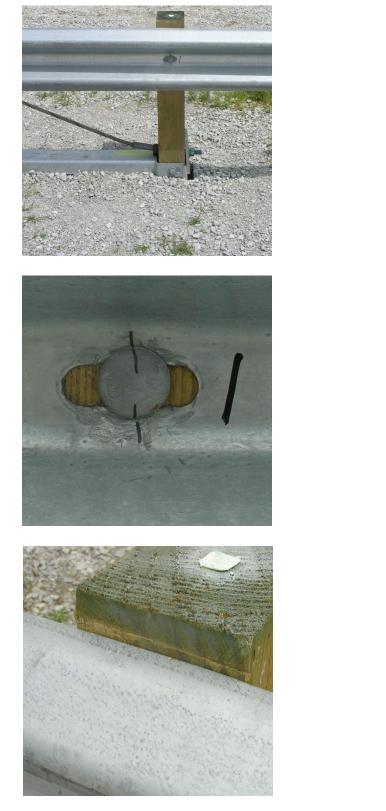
Upstream Anchor Damage, Test No. MGSSYP-1
